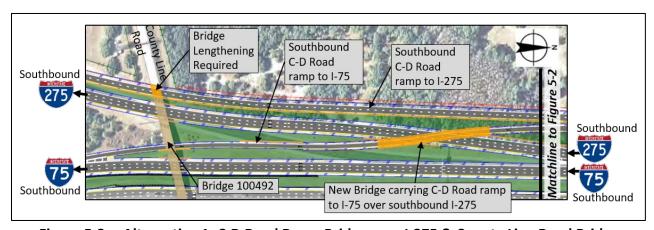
Alternative 1–C-D Road Ramp Bridge over I-275 & County Line Road Bridge
